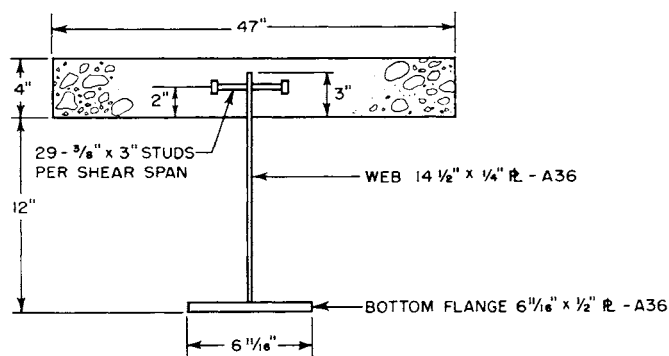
DESIGN DETAILS OF SERIES 4 SPECIMENS
